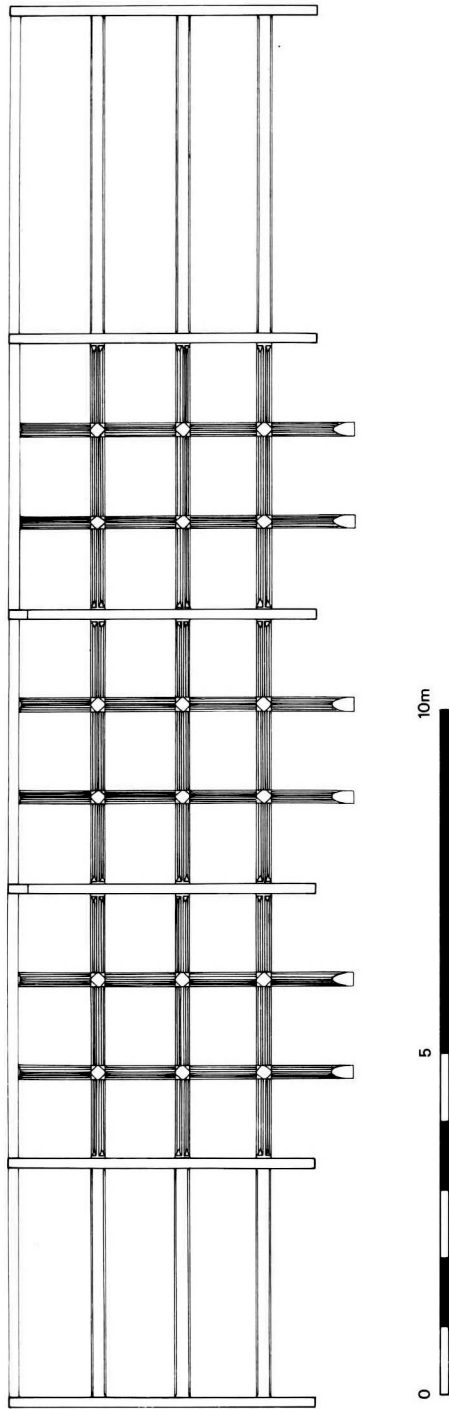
Elevation of one half of the moulded roof members in the refectory range.
